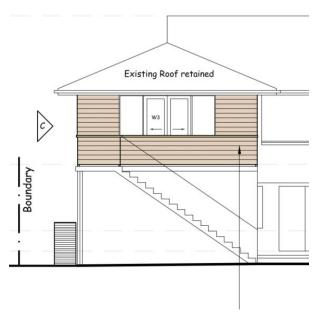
North Eastern Elevation as proposed under the subject modification application no. Mod2020/0308.
